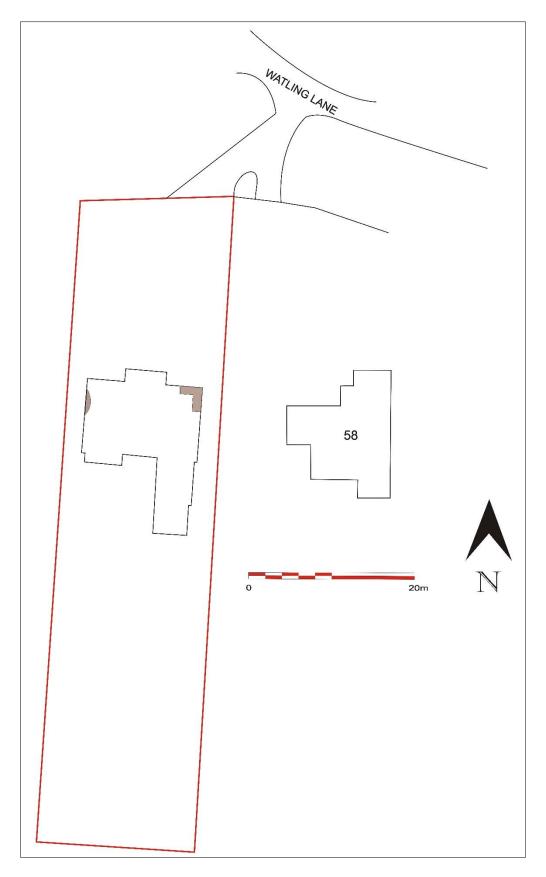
Plan showing the Project Site location with foundation trench and relative location of features [3] & [7]
